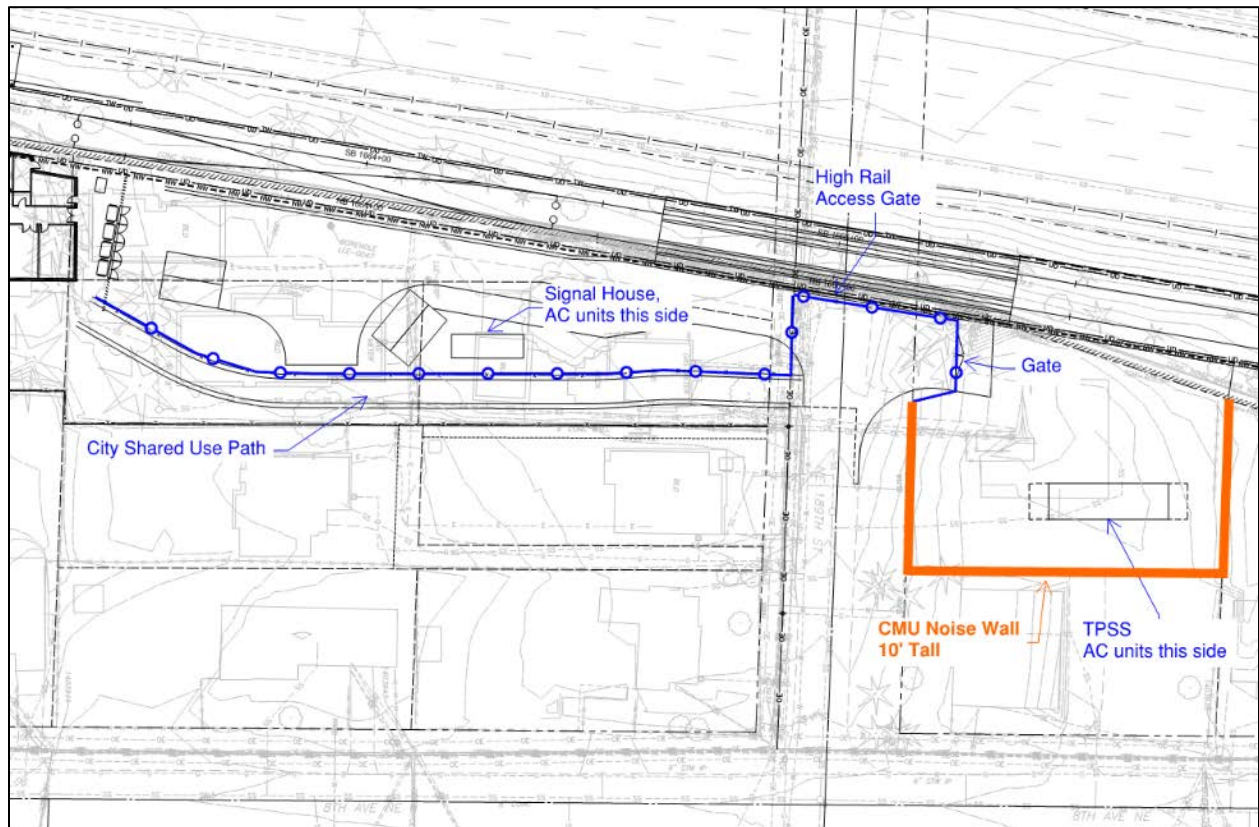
TPSS 3 and Shoreline North Station Signal House Site Plan
